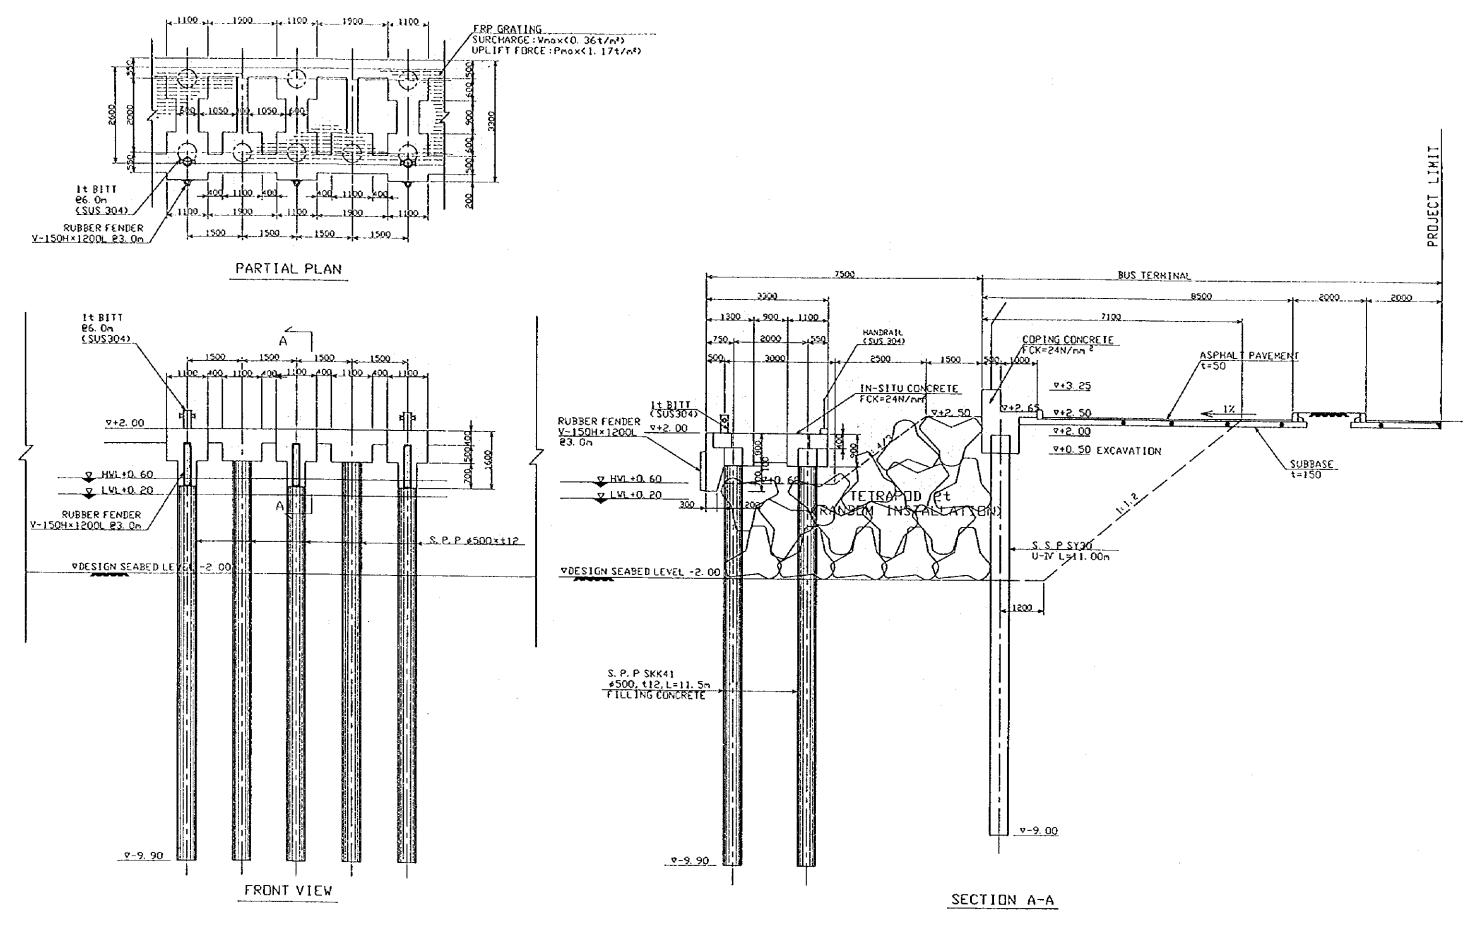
Front, Section and Plane views of the improvement of North Wharf
